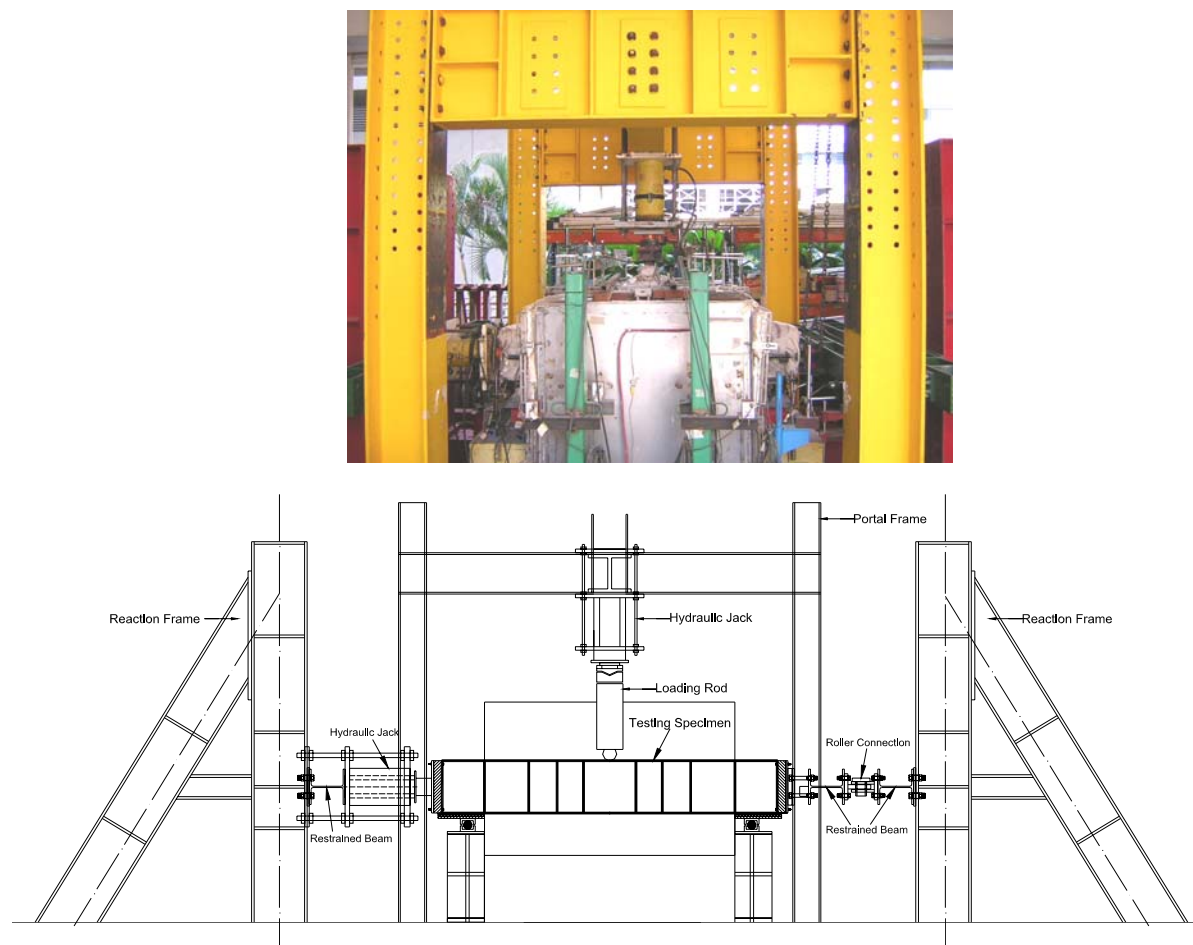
Restrained Plate Girder Test Set-up (Elevation View)
